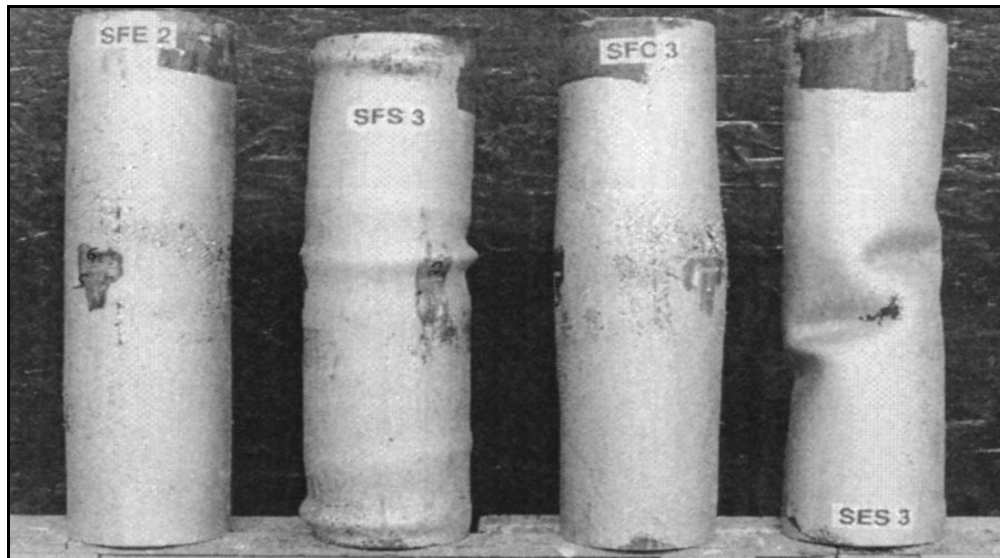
Failure Mode of Specimens (SFE) Entire Section, (SFS) Section with Steel, (SFC) Section with Concrete, (SES) Empty Steel Tube.
